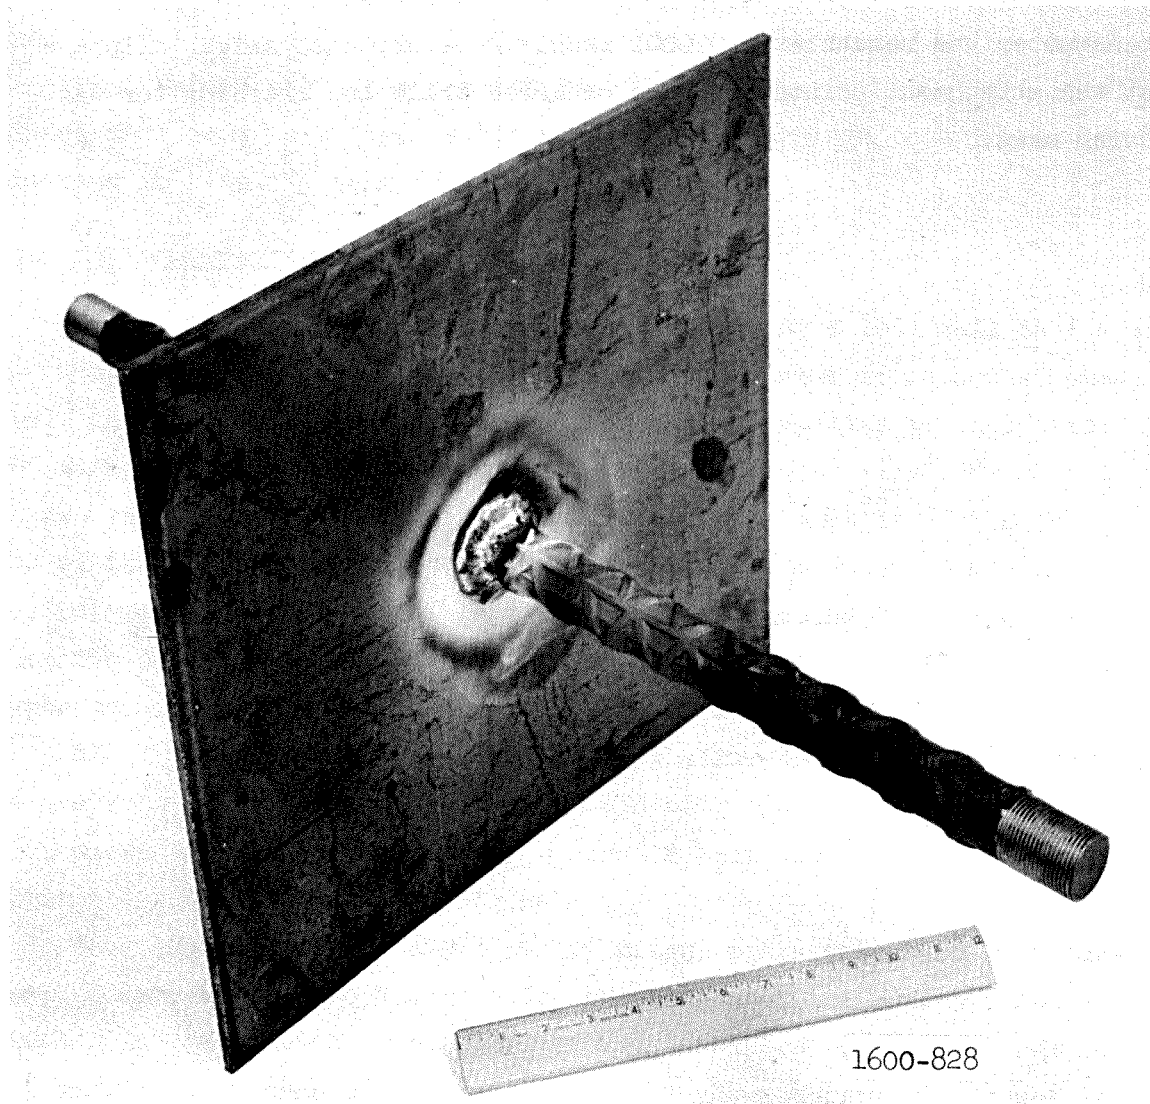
Pretest view of 1/4-inch-thick steel plate brazed to No. 11 rebar.
